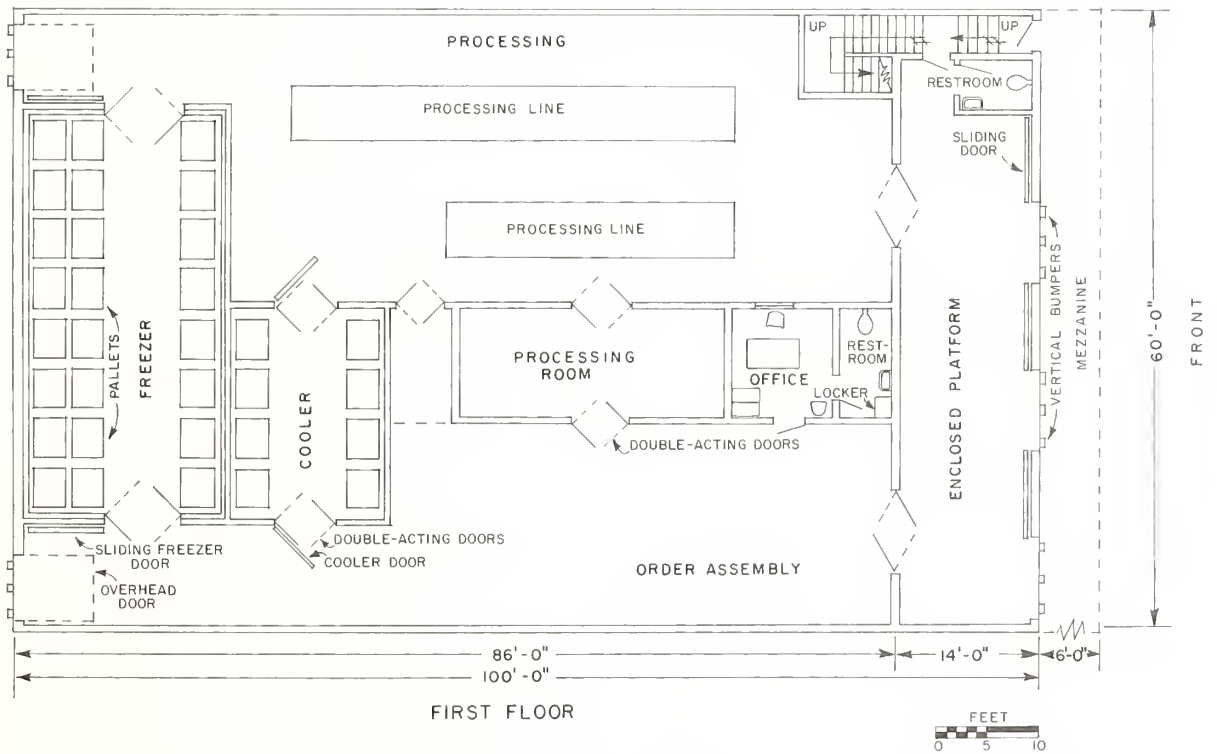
Layout of a fish and shellfish firm in two multiple-occupancy building units.
